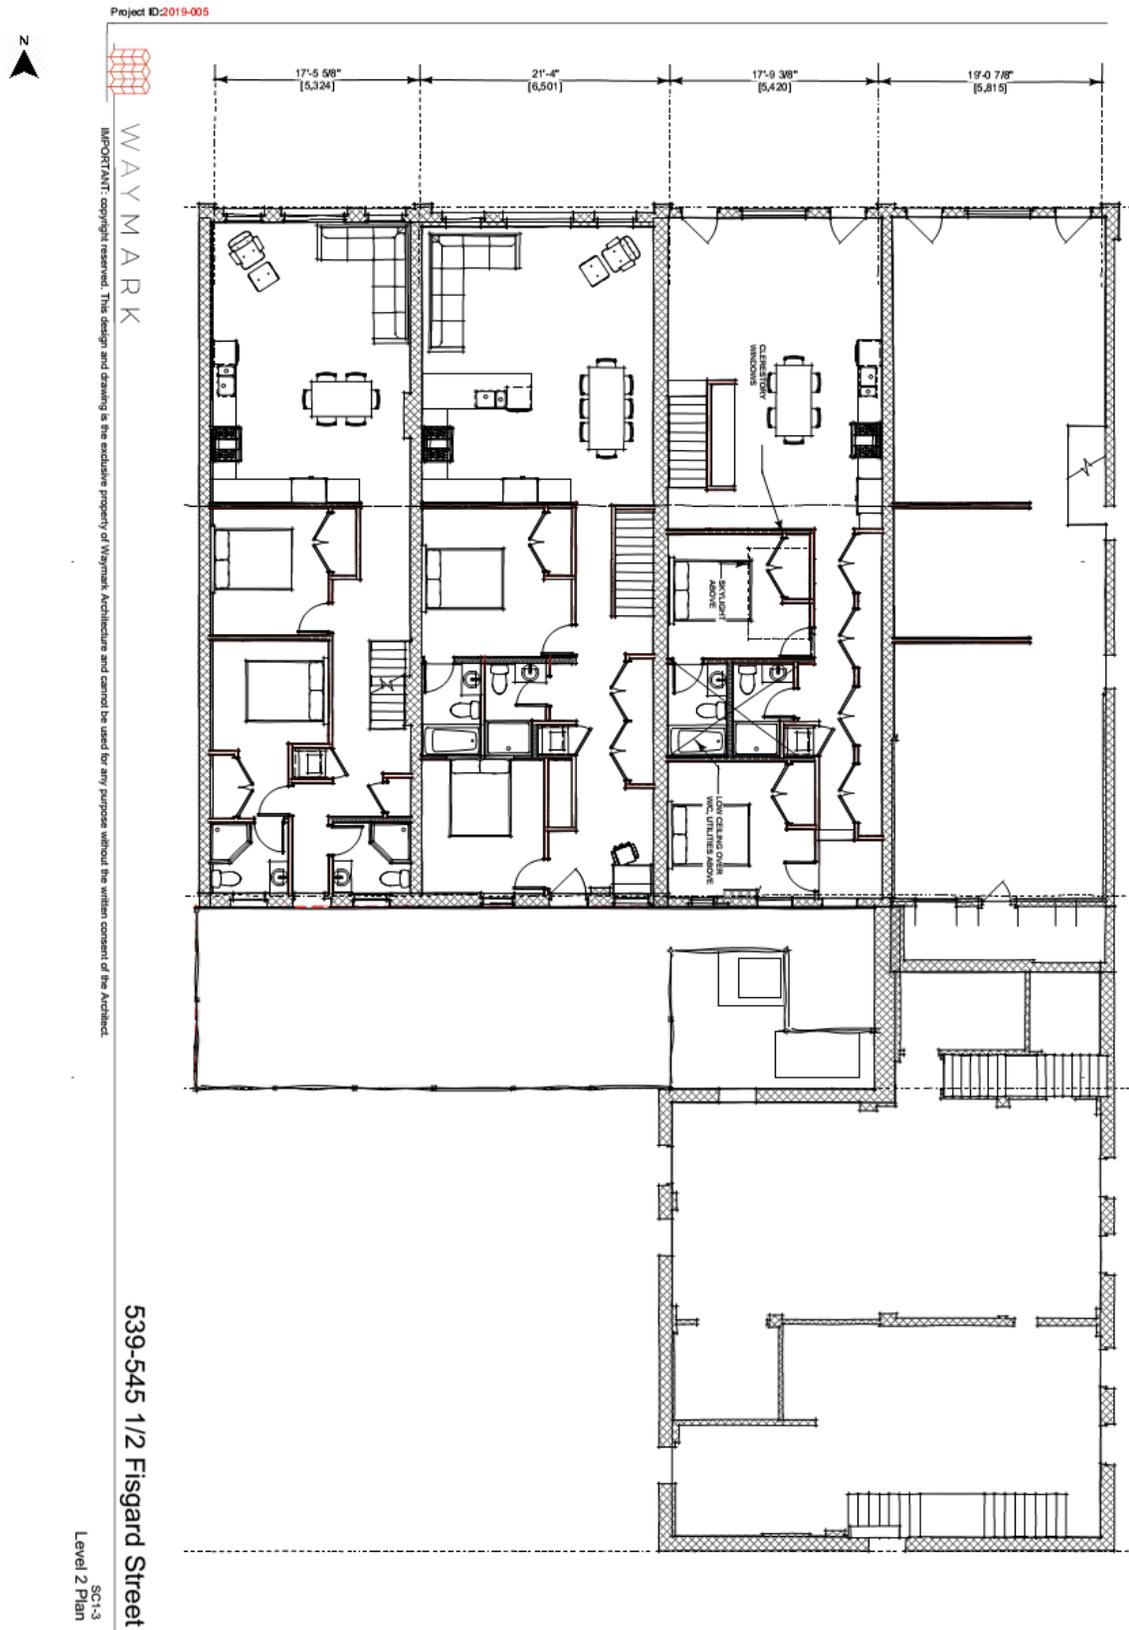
, Layout of 2<sup>nd</sup> floor of the building
